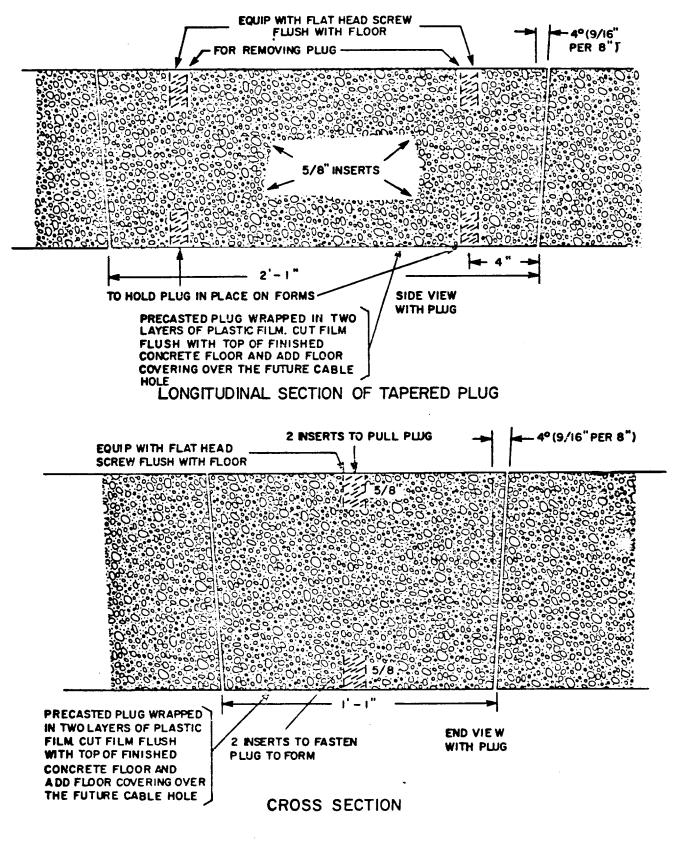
Precast Concrete Plug for Cable Holes Between Columns
